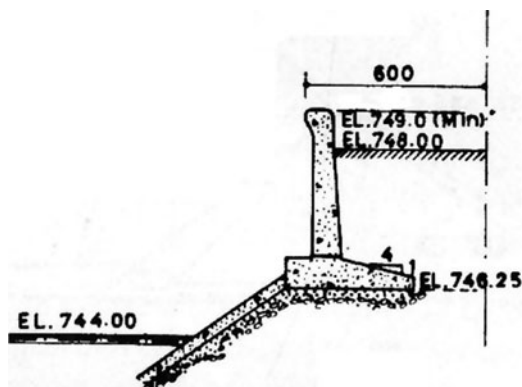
Cethana Dam (Australia). Layout of joints and details. (Source: Singh and Varshney)
